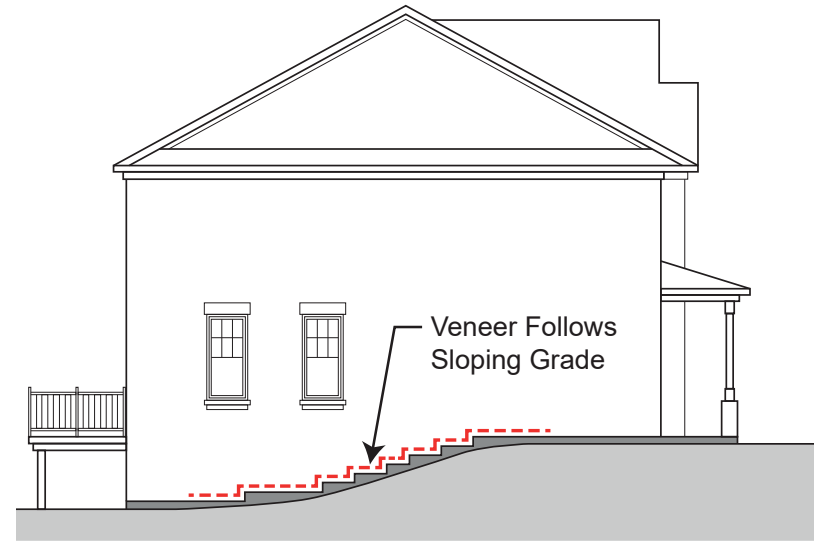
Veneer should be stepped to follow sloping grade to limit exposure of the foundation wall
